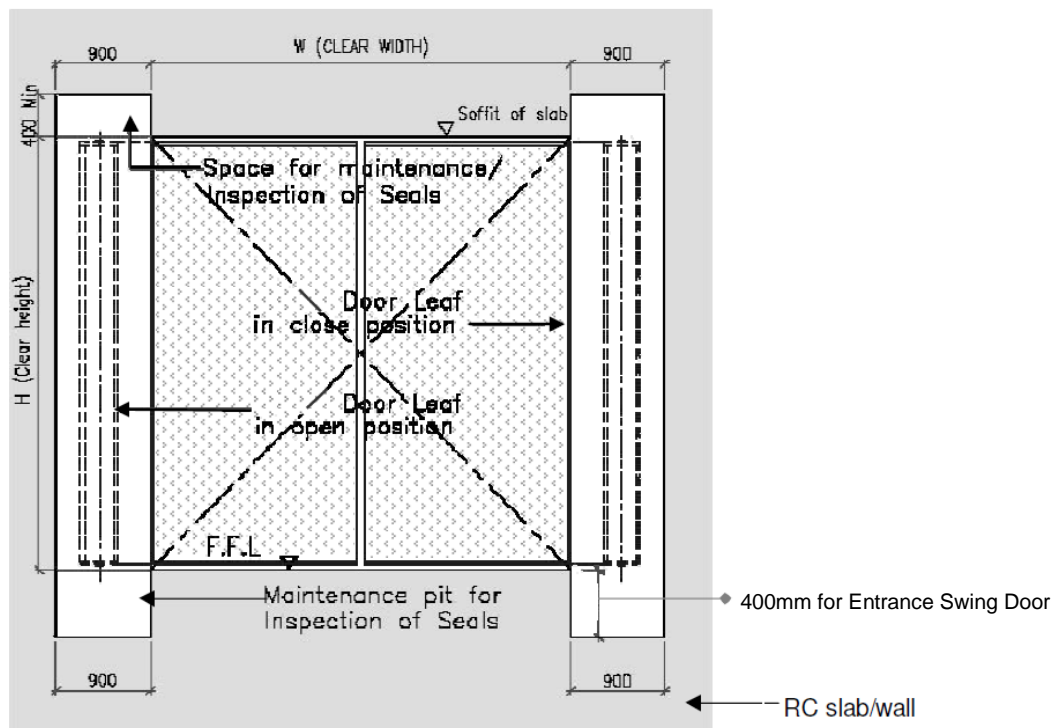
Elevation view for large steel swing door with maintenance pit
